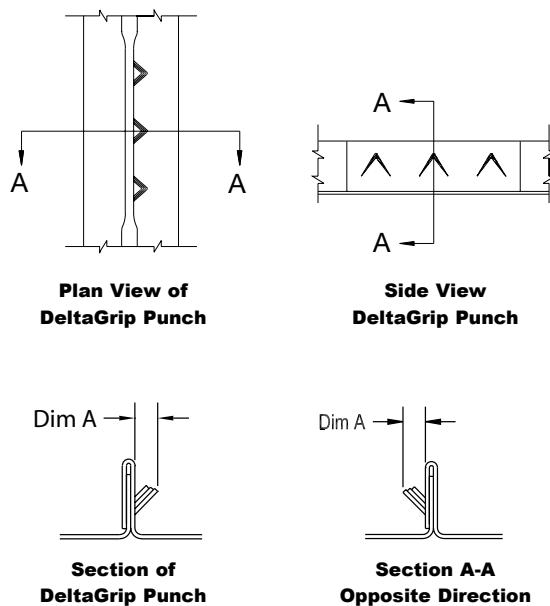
DELTAGRIP PUNCH VIEWS
